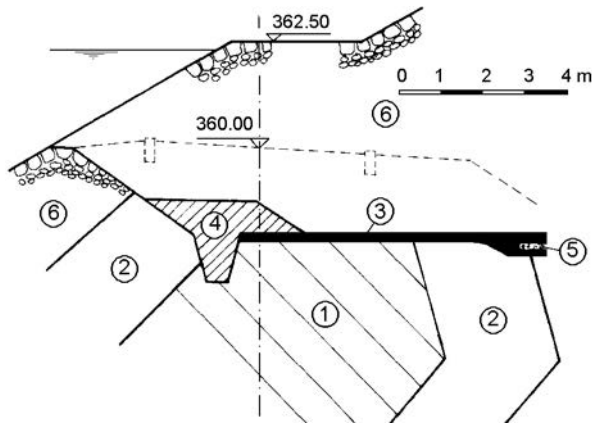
Breitenbach Dam, joint of the horizontal asphalt concrete layer with the clay core (Weinhold & Haug, 1988). (1) Core made of loam; (2) transition zone; (3) horizontal asphalt concrete layer; (4) special clay; (5) drainage layer; (6) rockfill.
